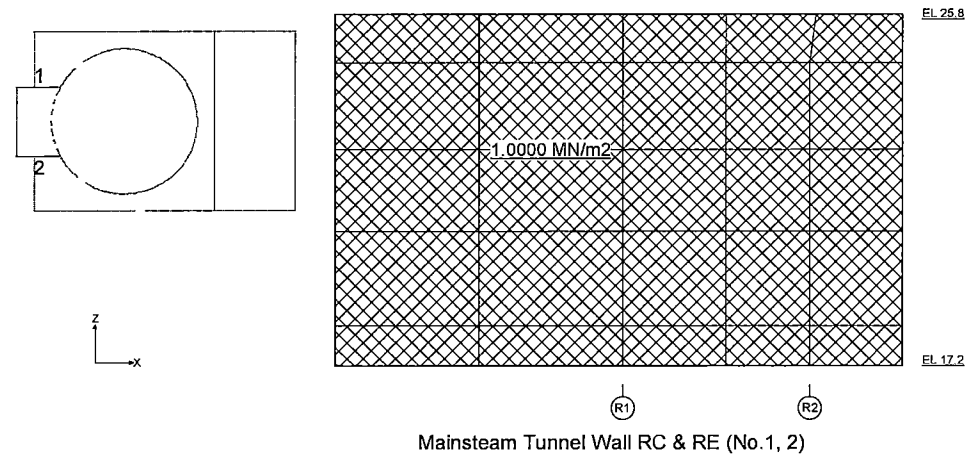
HELB Pressure Load (MS Tunnel: Walls)
